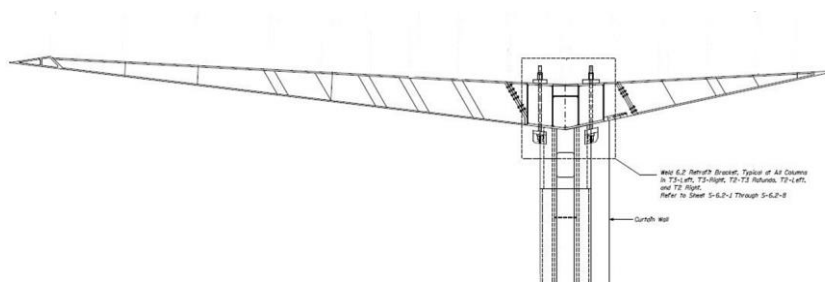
Column to box girder - Weld 6.2 connection retrofit
